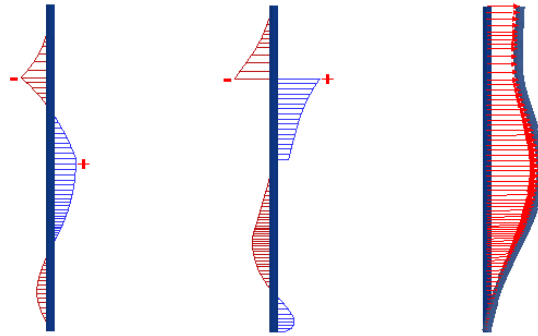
(a) Bending moment in the sheet pile (b) Shear force in the sheet pile (c) Deformation in the sheet pile, for Nieuw Delft in the Earthquake load case, where GWT = MSL.
